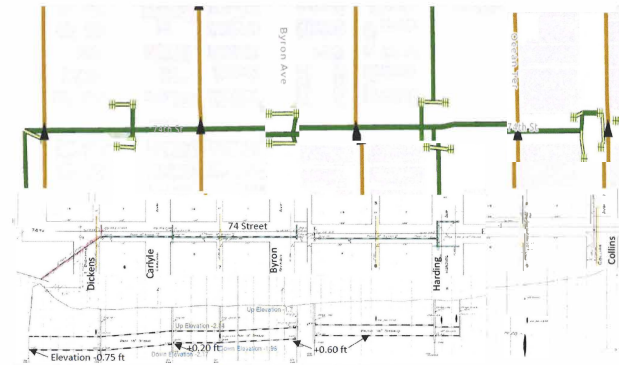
Storm Conveyance Construction Drawings at 74 Street.
